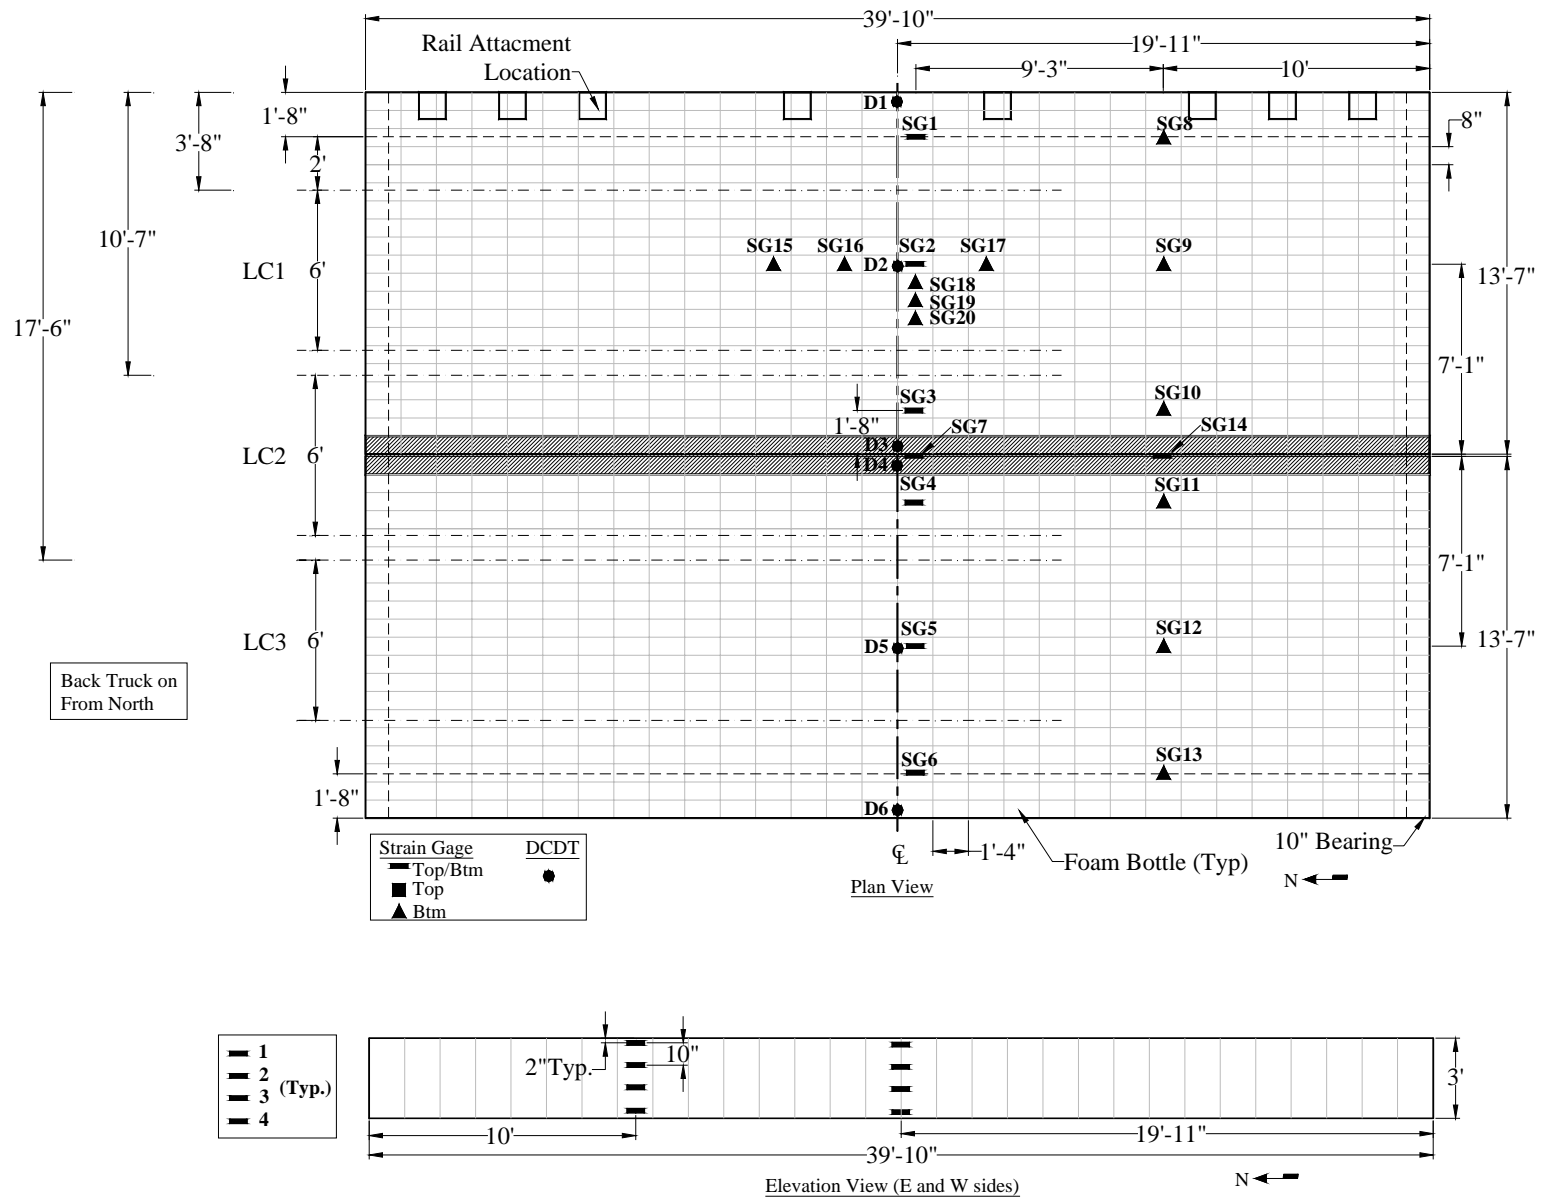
Instrumentation layout, Test 1, FRP Deck Bridge (vehicle facing north).
